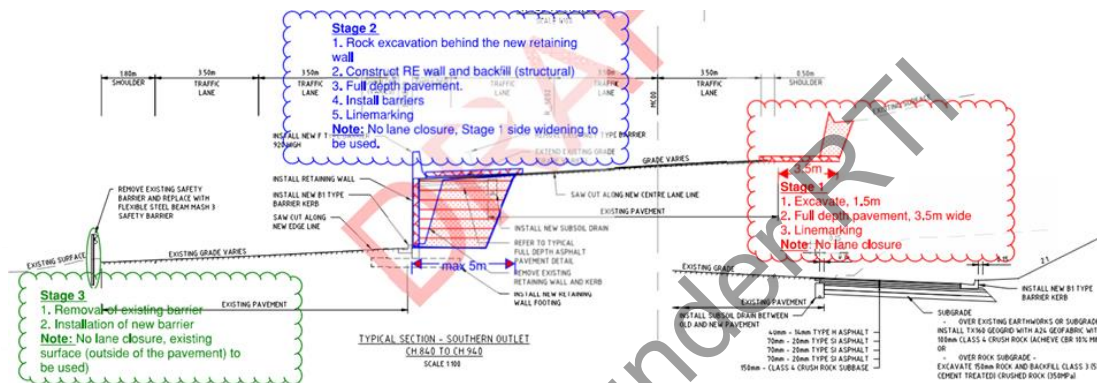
Typical section – Southern Outlet Ch. 840 to Ch. 940
